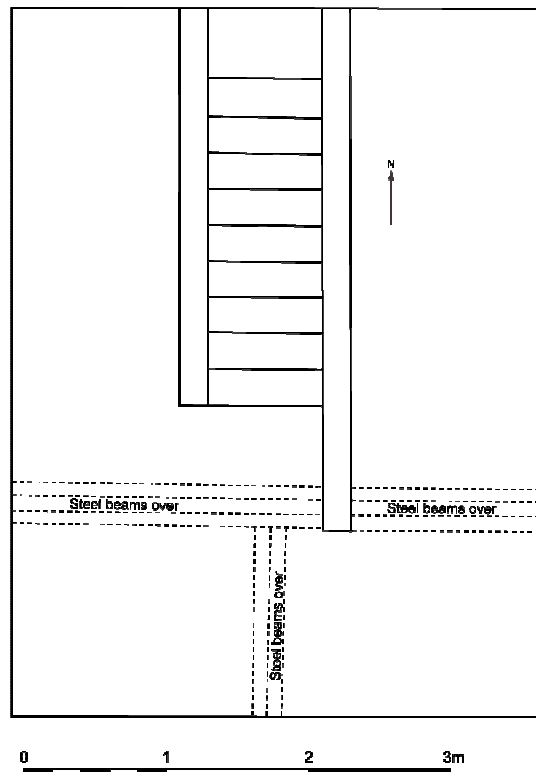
Plan of Air Raid Shelter, Manor Croft, Hart
